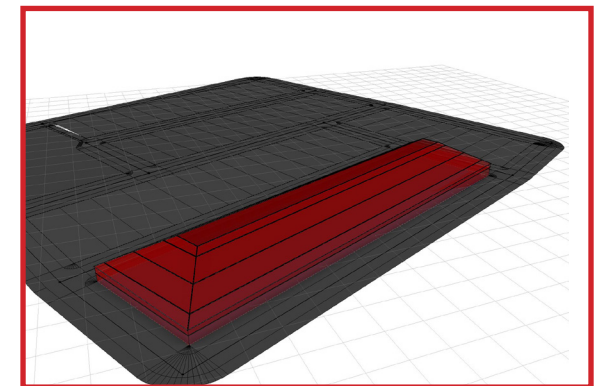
The building envelope returns from the set building height at the street at an angle of 30%.
